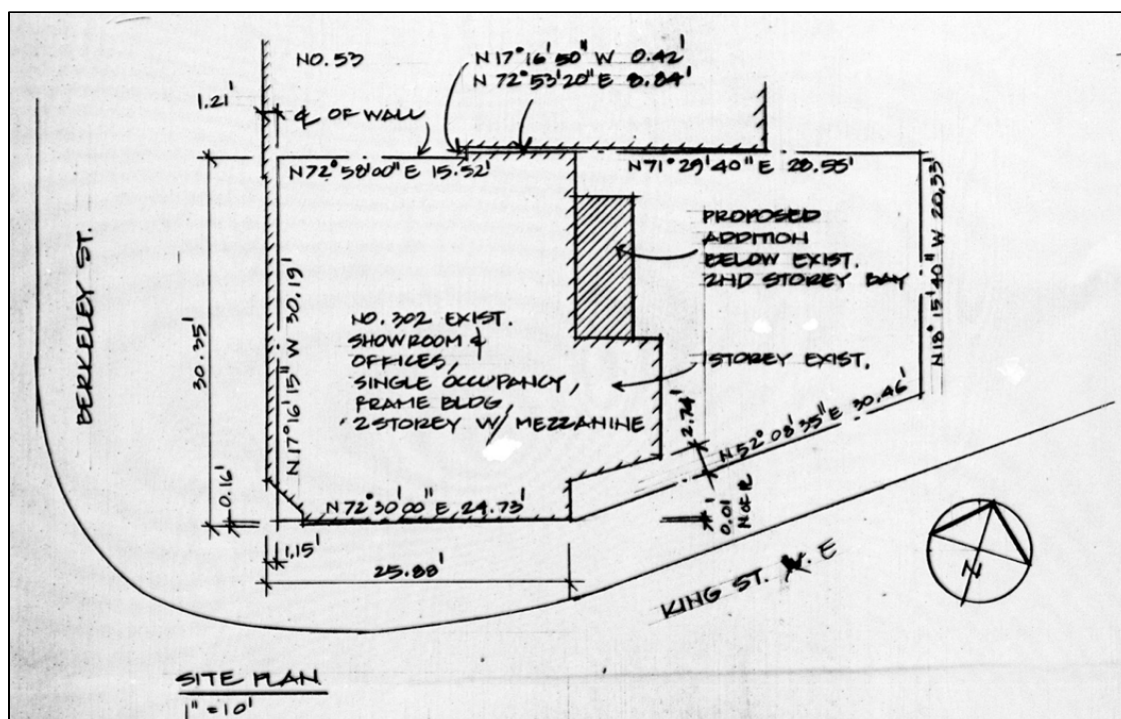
Site plan, proposed 1989 one-storey addition at east facade. Toronto Building Records.
